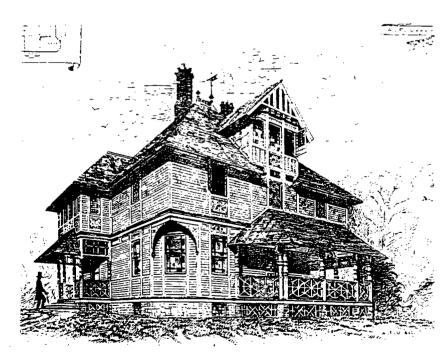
Alexander F. Oakey, House at Lenox, Mass. (American Architect, 1876).
